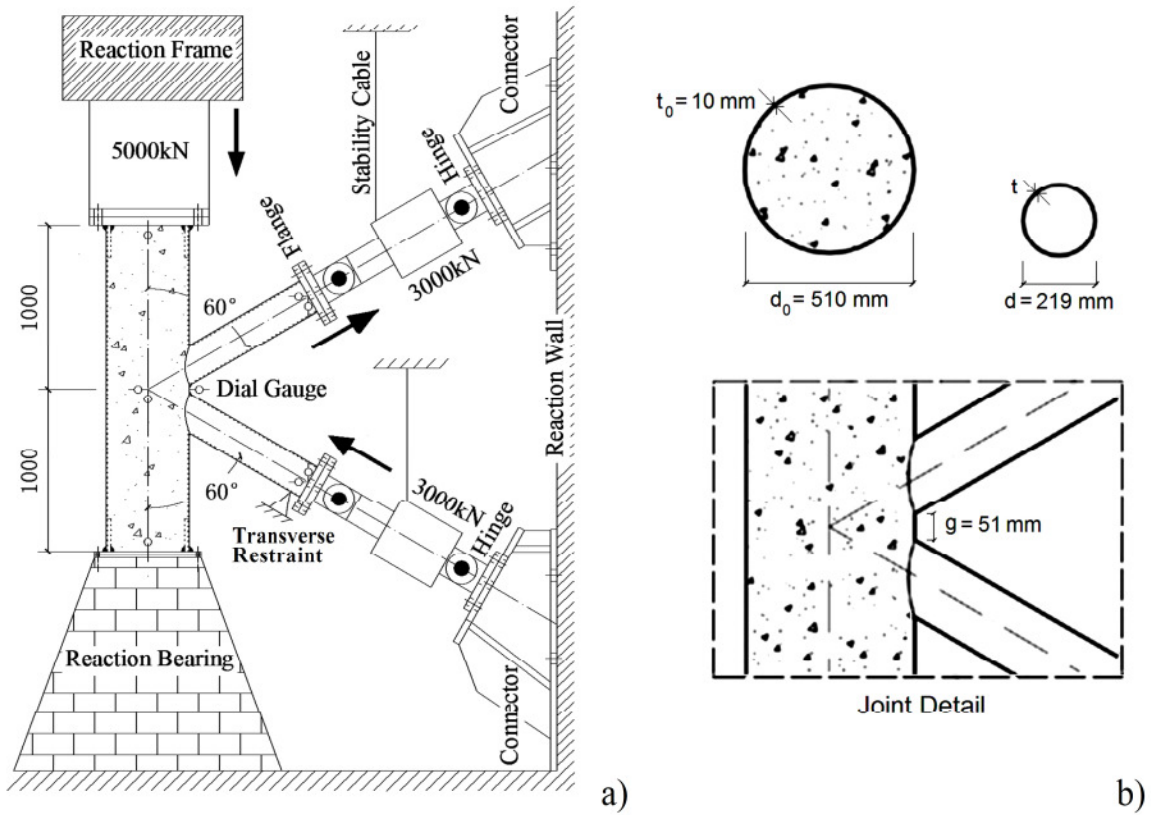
Test set-up (a) and detail of specimen geometry (b)
